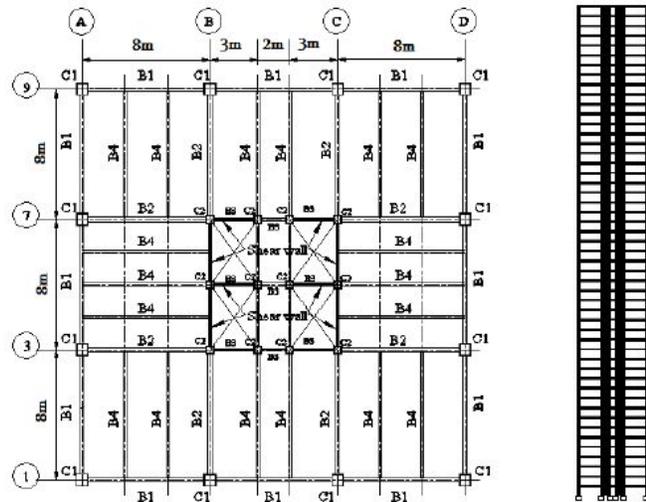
Shear-Wall Frame structure (Typical floor plan and elevation)
